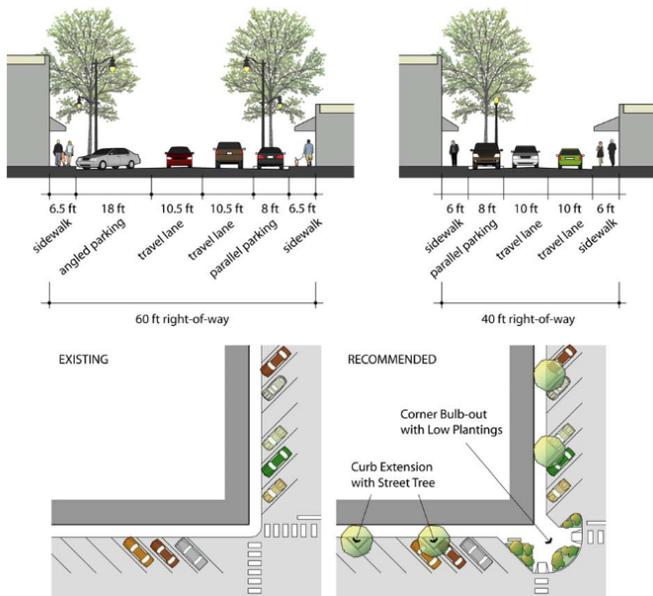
Streetscape Improvements. Curb extensions and corner bulb-outs create space to add landscaping and street furniture, enhancing the walking experience without sacrificing on-street parking spaces.
